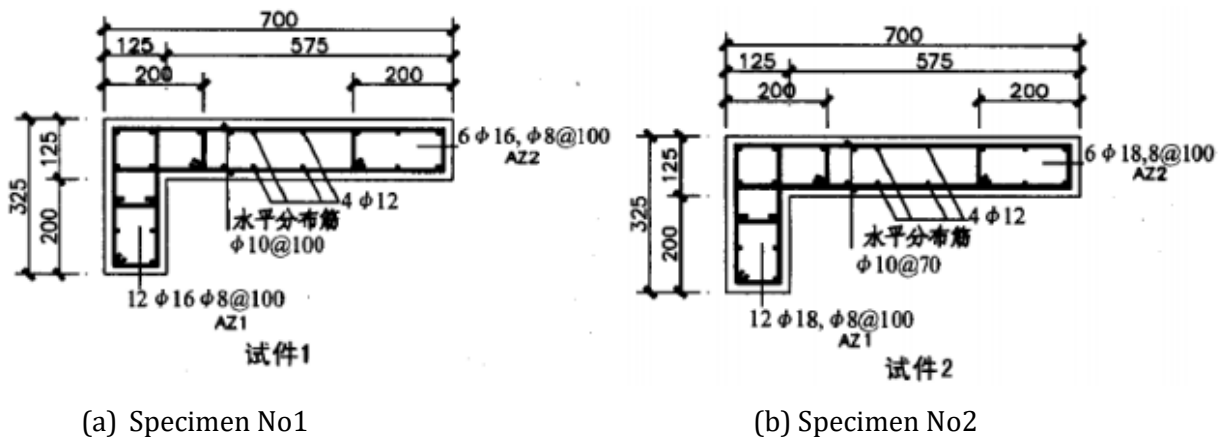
Test Specimen Geometry and Reinforcement Details for Hu [93]
